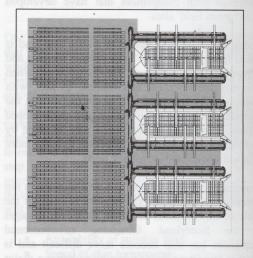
Plan View of a Container Vessel 'Docking System Layout.
